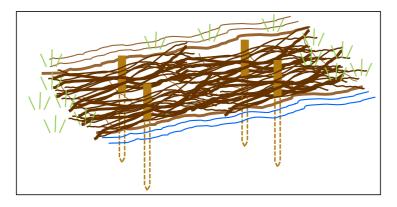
Securing brash, brash bundles, small trees or large wood to the bank face with wooden stakes or reinforced bar and stainless steel cabling
